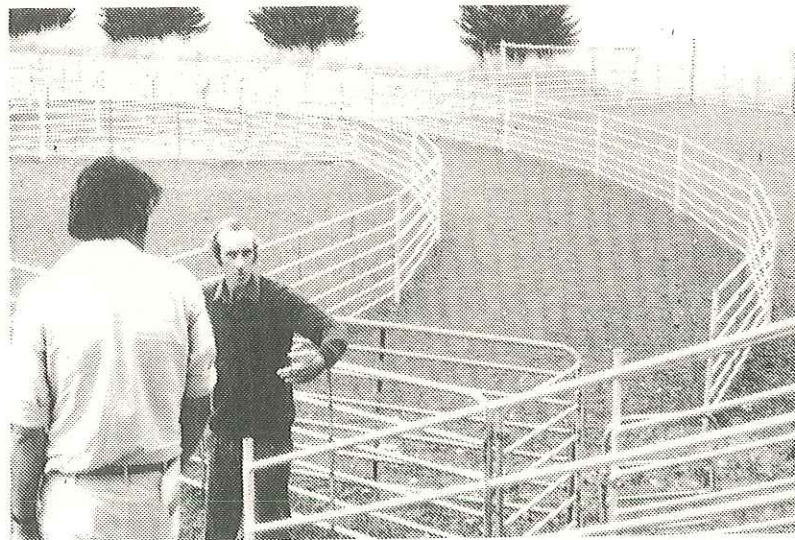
Sheep yards using steel pipe posts and rails with vertical droppers between posts.
